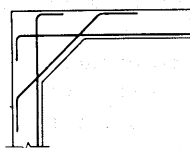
Reinforcement along the inner side of corner, etc. in a haunch or frame
